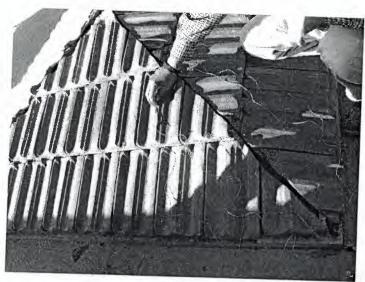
The roof tiles were put above the roof battens for both L1 and L2. Thermo couple cables were put to the layers of both hip roofs on their south facades.
